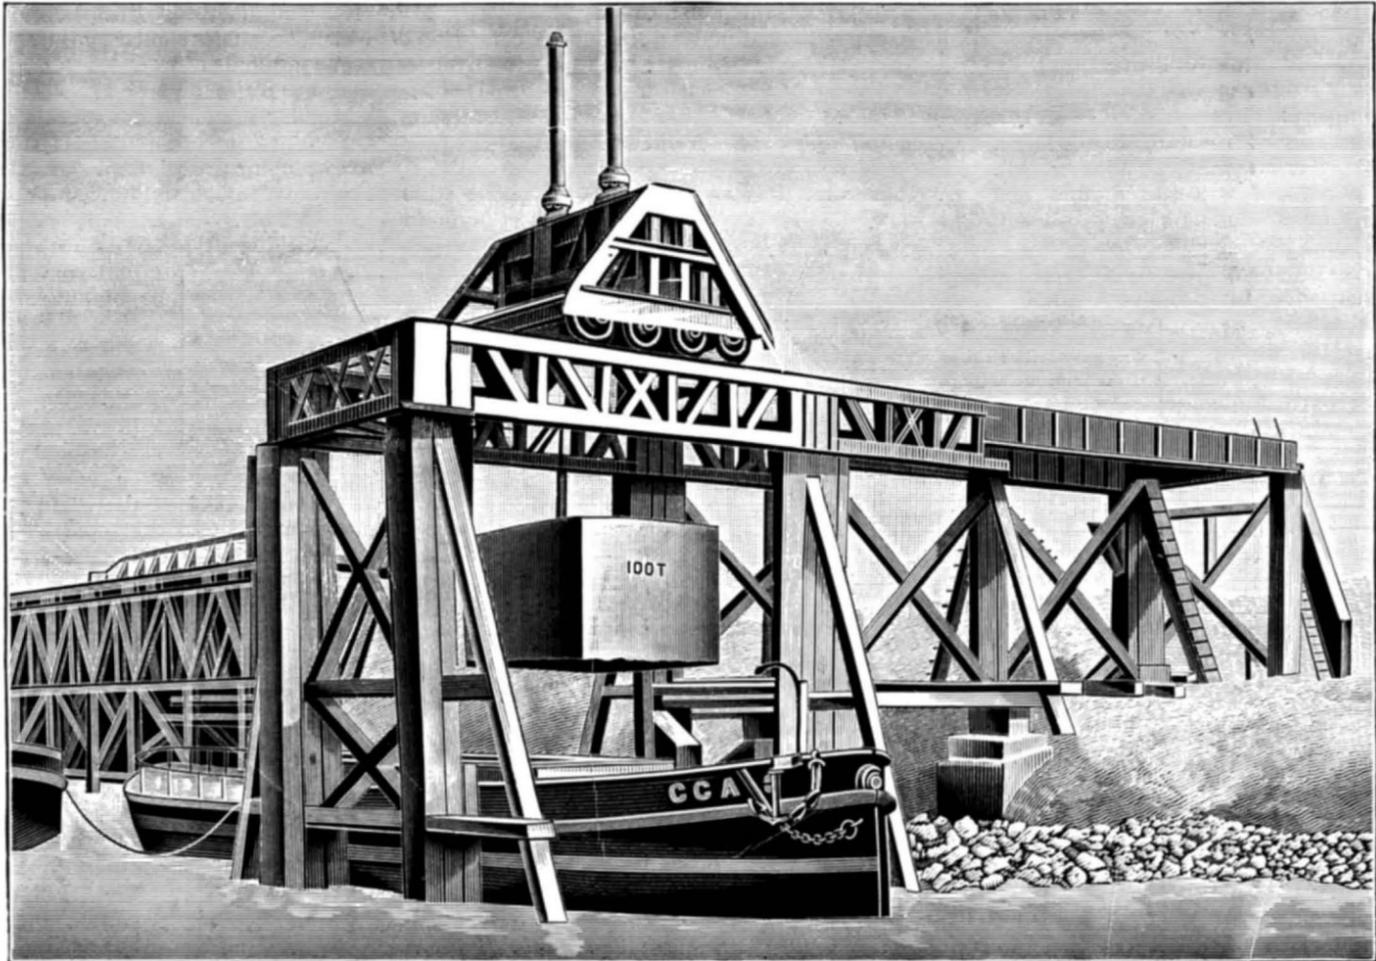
WORK AT THE PORT OF BILBAO—FRAMEWORK AND APPARATUS FOR LIFTING BLOCKS OF BETON AND LOADING THEM ON A BARGE.
